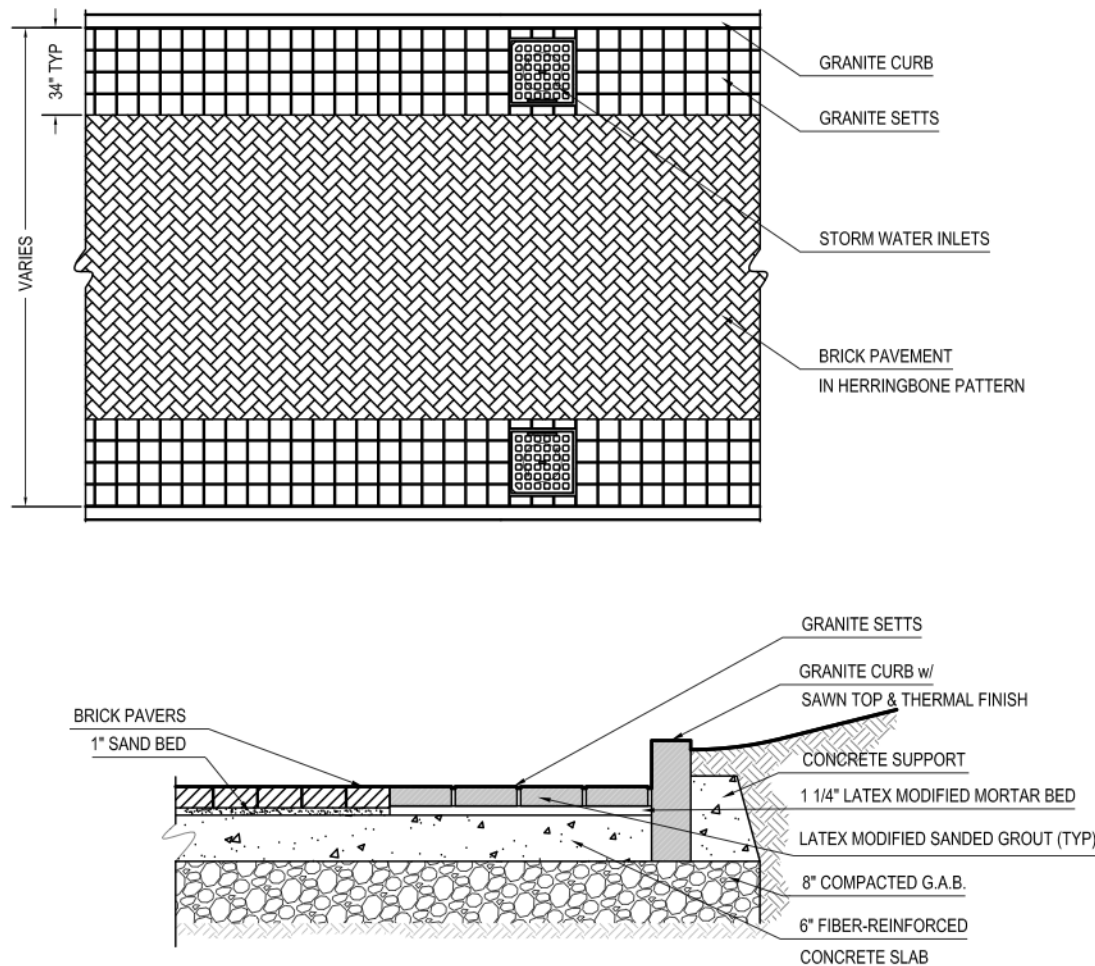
Plan and Section of Type A: Brick Paving with Granite Curb and Gutter.
